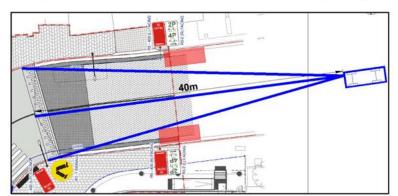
A diagram demonstrating the Approaching Sight Distance for northbound traffic in Charles Street as per section 3.2.1 of Austroads Guide to Road Design (2017) Part 4A
